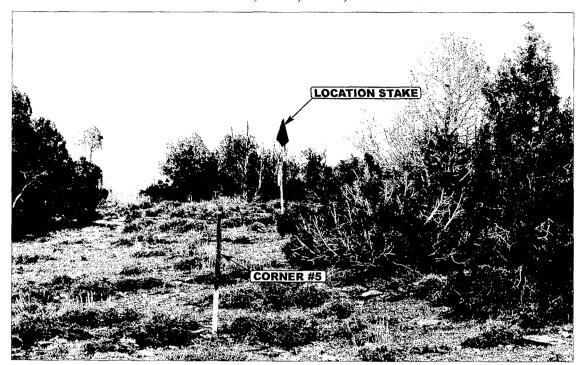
PHOTO: VIEW FROM CORNER #5 TO LOCATION STAKE
